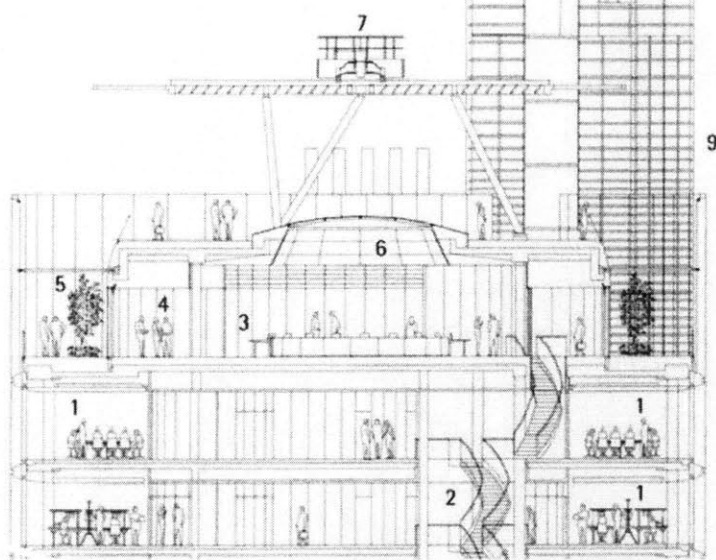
Schematic of top five floors. Note that curving stairs allow transit from floor to floor with ease. Fire codes were met by using special glass fire doors for zoning. The façade of the building continues to the top two floors. There is no roof over the outer ring of the upper two floors, thus creating an open-air garden space.
